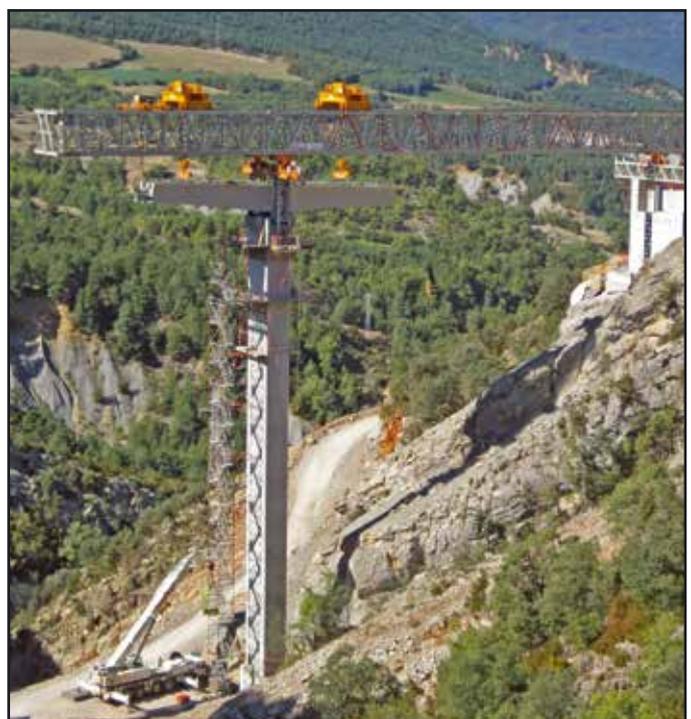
Egea Bridge - gantry-erected bespoke beams.
